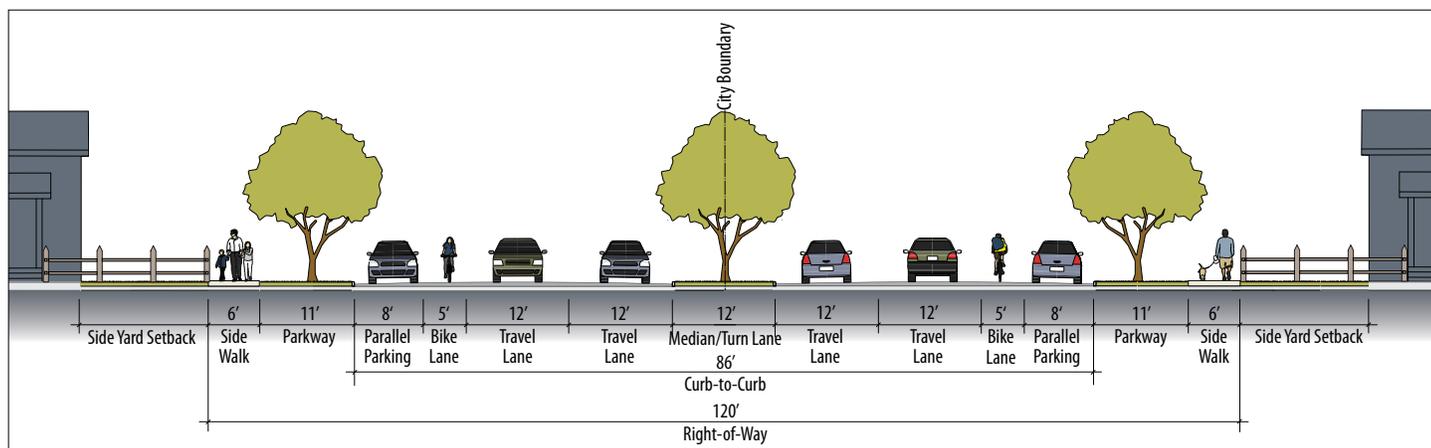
Oak Avenue (San Antonio Extension) - Potential Future Buildout, 4-Lane Section
